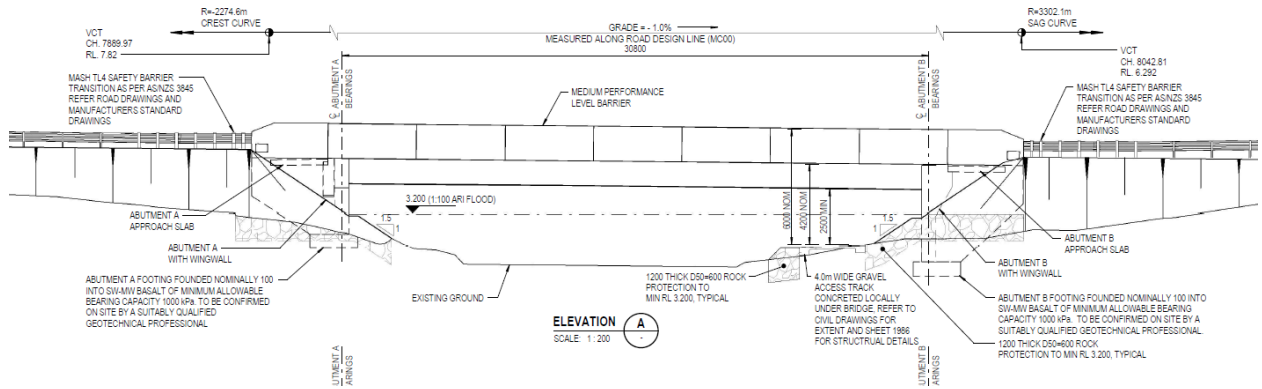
Shows proposed bridge over Sorell Rivulet. (Source: planning application documentation)
